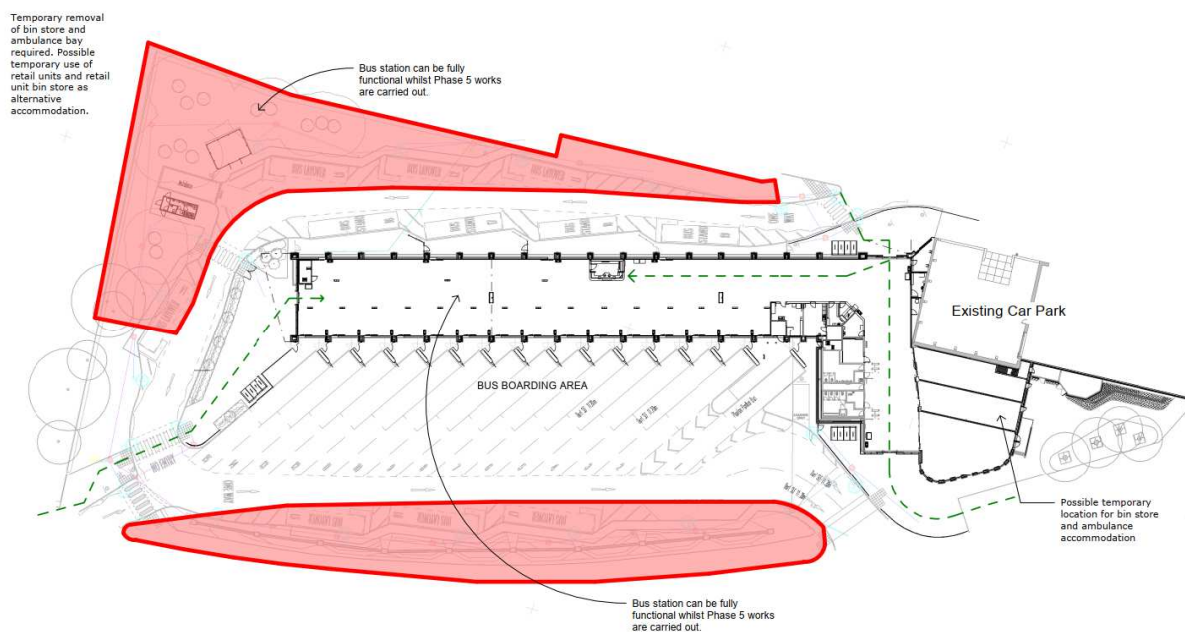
Phase 5 Plan – Perimeter Layover Bays and Landscaping
